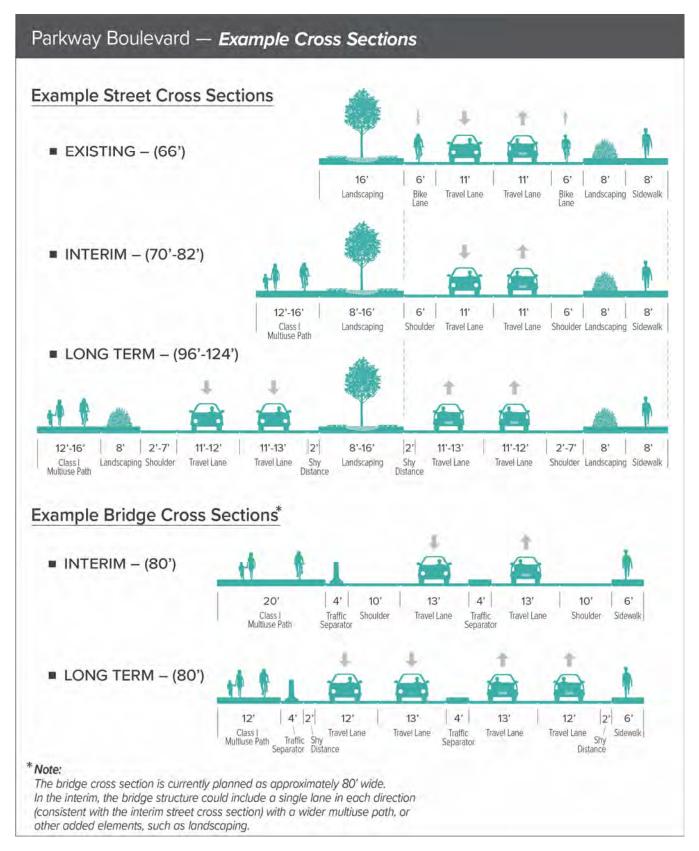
EXAMPLE PARKWAY BOULEVARD CROSS SECTION
